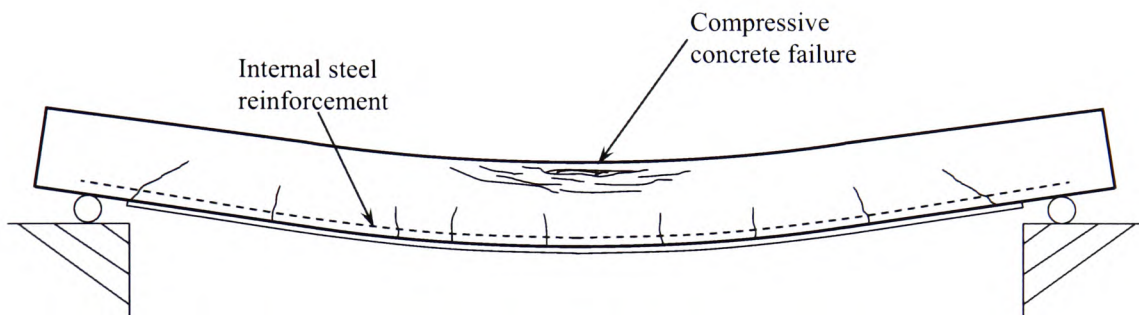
Diagram of sudden compressive concrete failure
